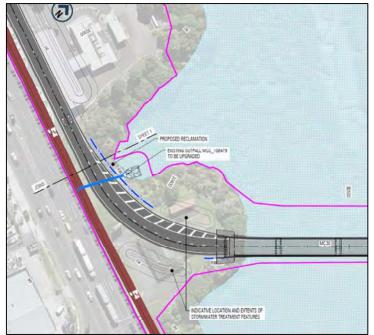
Busway Abutment between 242 and 254 Tī Rākau Drive (Bridge B)
